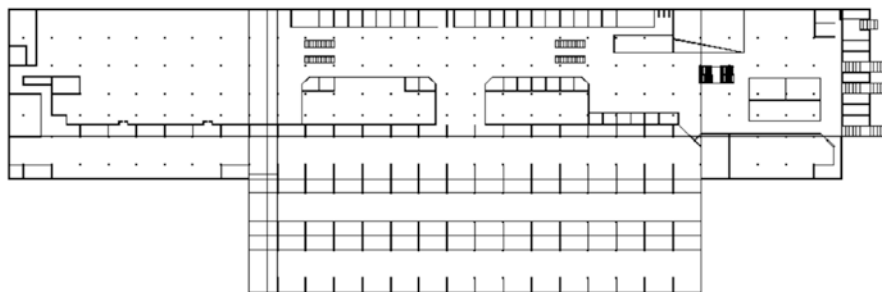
Construction drawing of Blok M mall building at B2 floor
